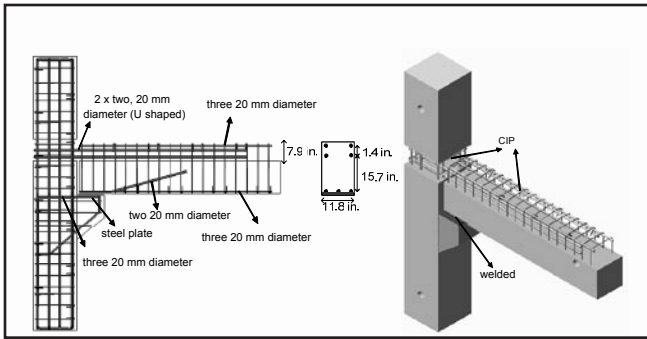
Reinforcement detail and assembly process of composite connection. Note: 1 in. = 25.4 mm.
